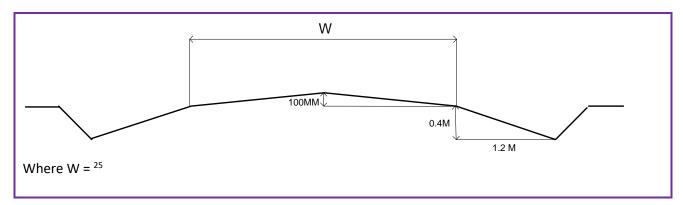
STANDARD CROSS-SECTION - All access tracks are to be constructed to the standard cross-section
